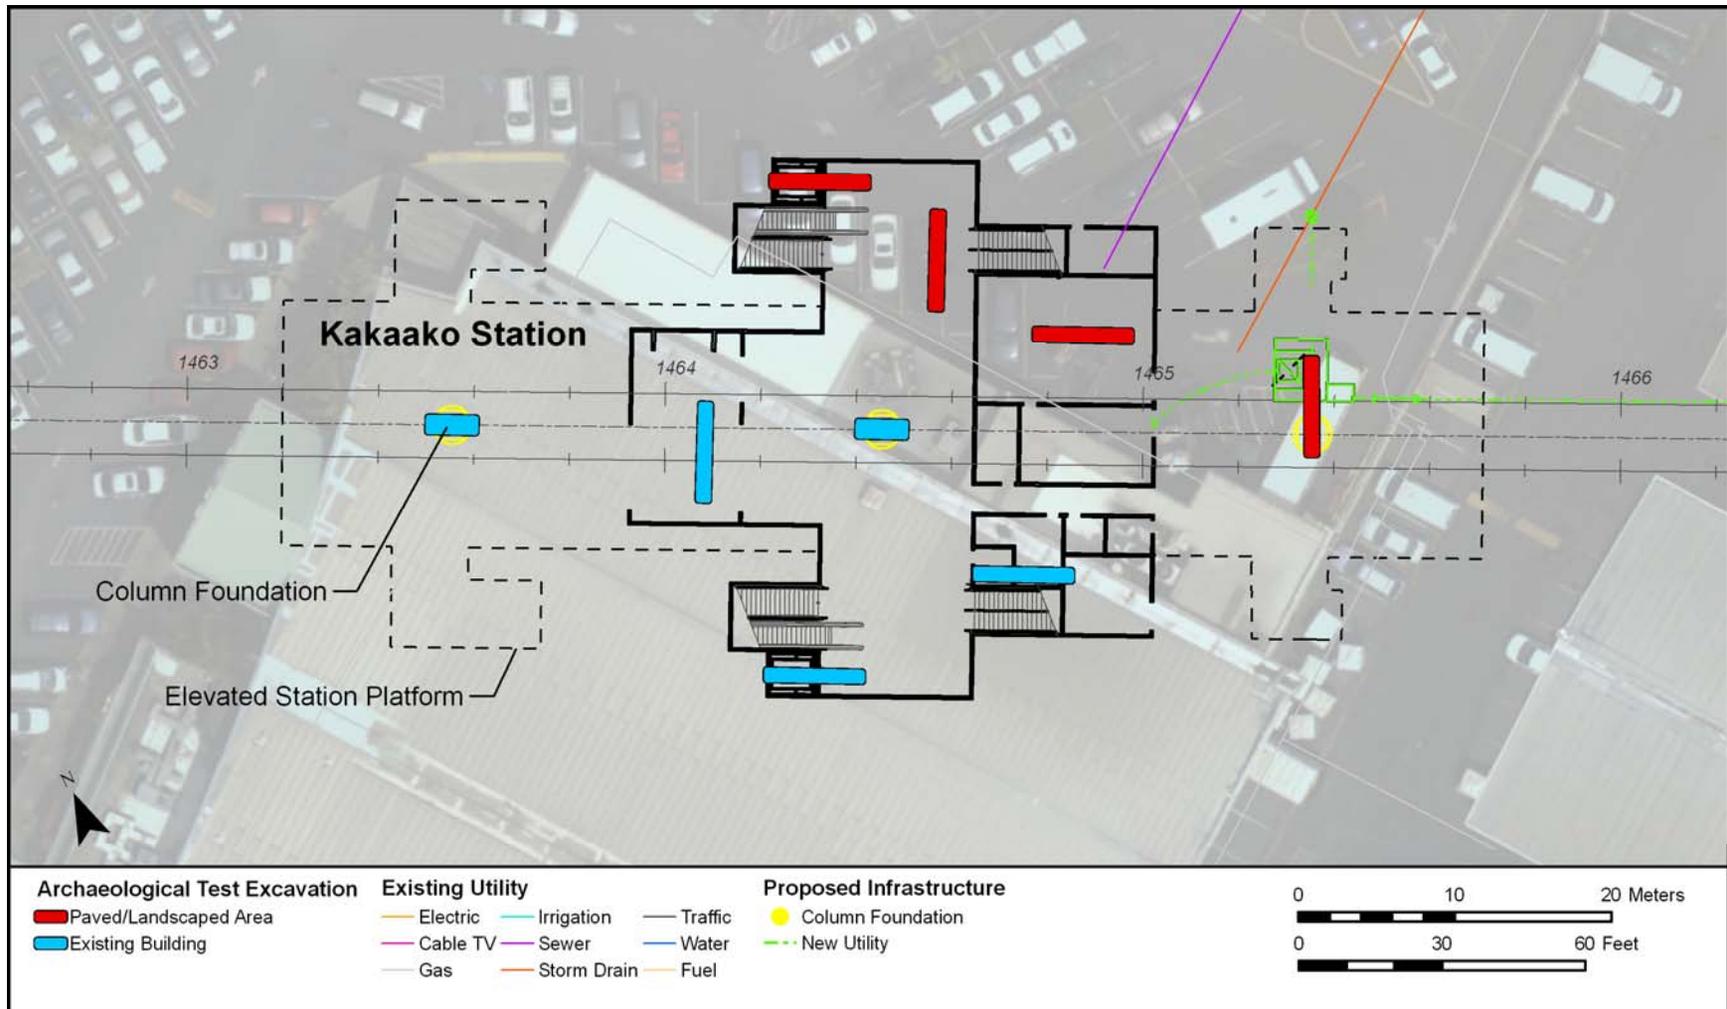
Kaka'ako Station, detail of column foundation layout showing proposed locations for archaeological inventory survey testing (test all three station column foundations with 3' by 10' excavations)
